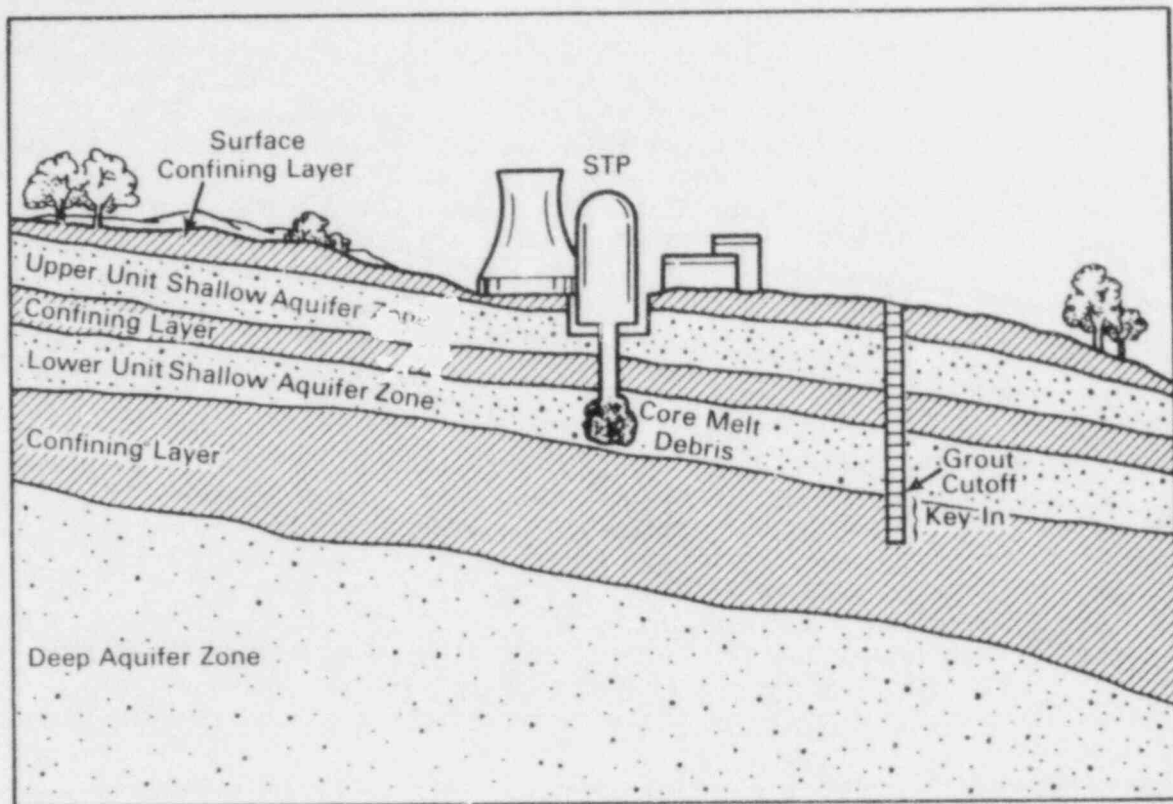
Schematic of Typical Grout Curtain Placement for the STP.
